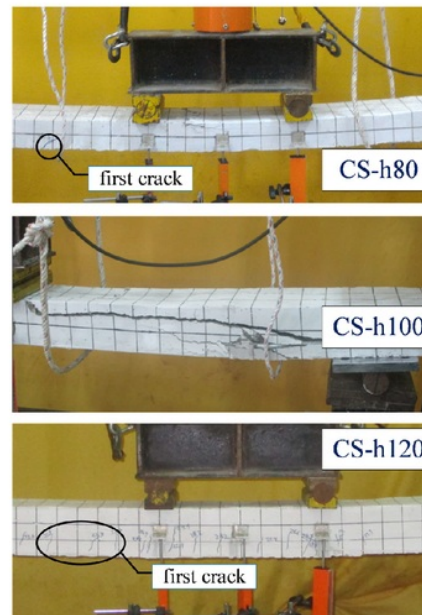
Crack pattern of the composite cold-formed steel and concrete specimens
